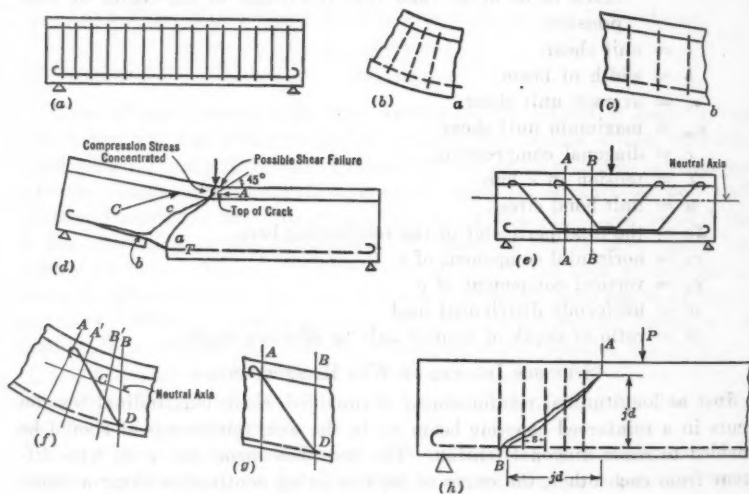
ELEMENTS OF VARIOUS REINFORCED CONCRETE BEAMS.
